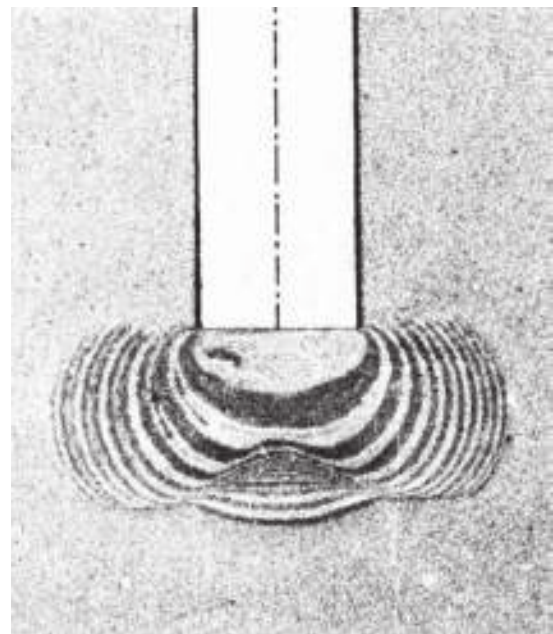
Failure Pattern Under Pile Point in Dense Sand
